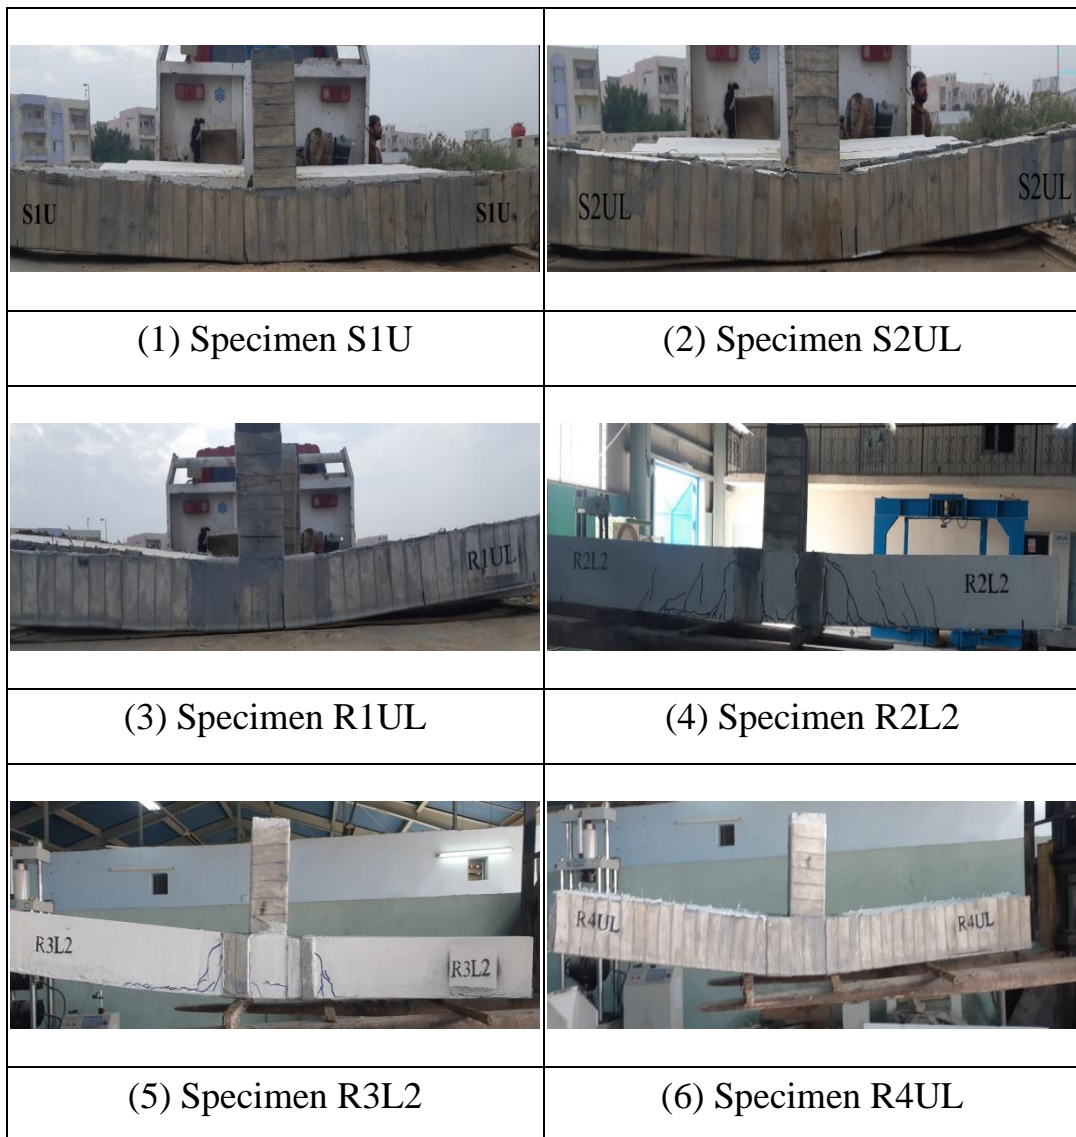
Crack Patterns of strengthened and retrofitted specimens
